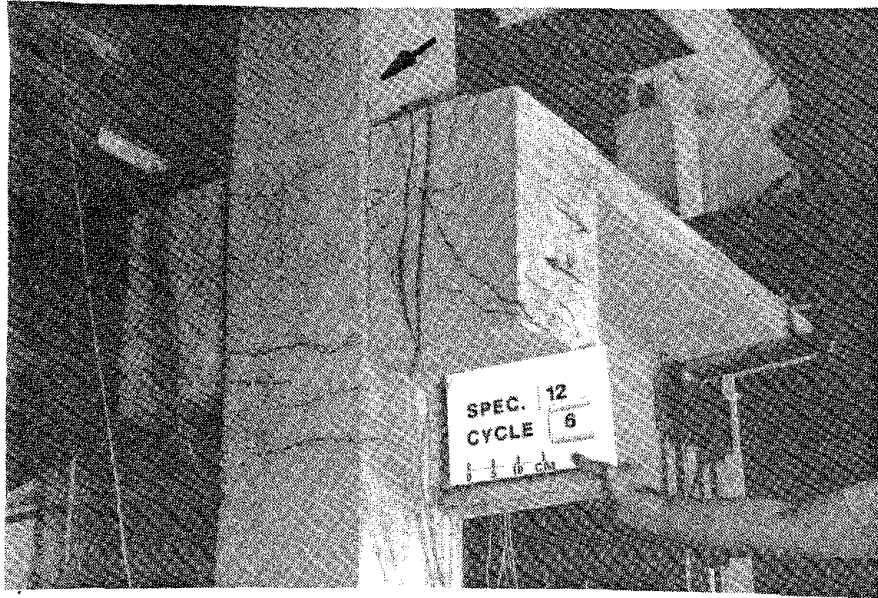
Extension of Cracks into the Column of Specimens with Slab.
